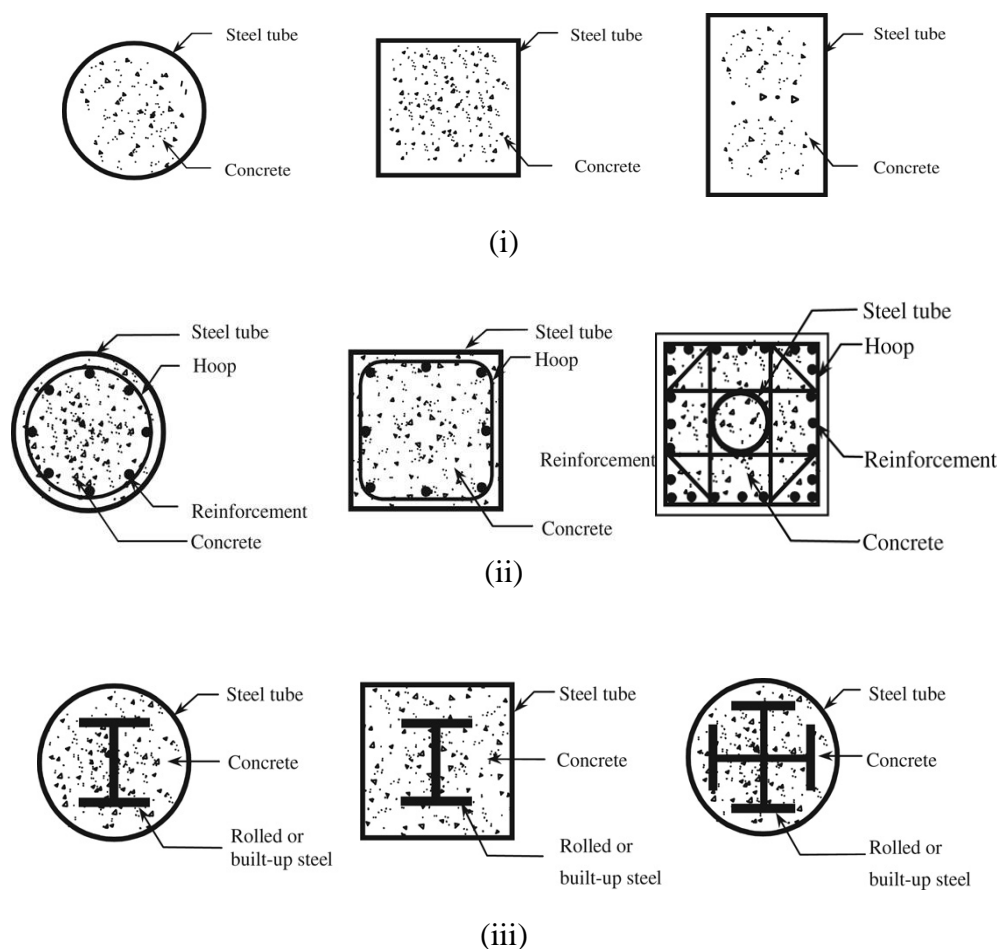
Different types of CFST. (i) Plain concrete filled hollow section (ii) Reinforced concrete filled hollow section (iii) CFST with encased steel section (Eurocode 4-2005)
